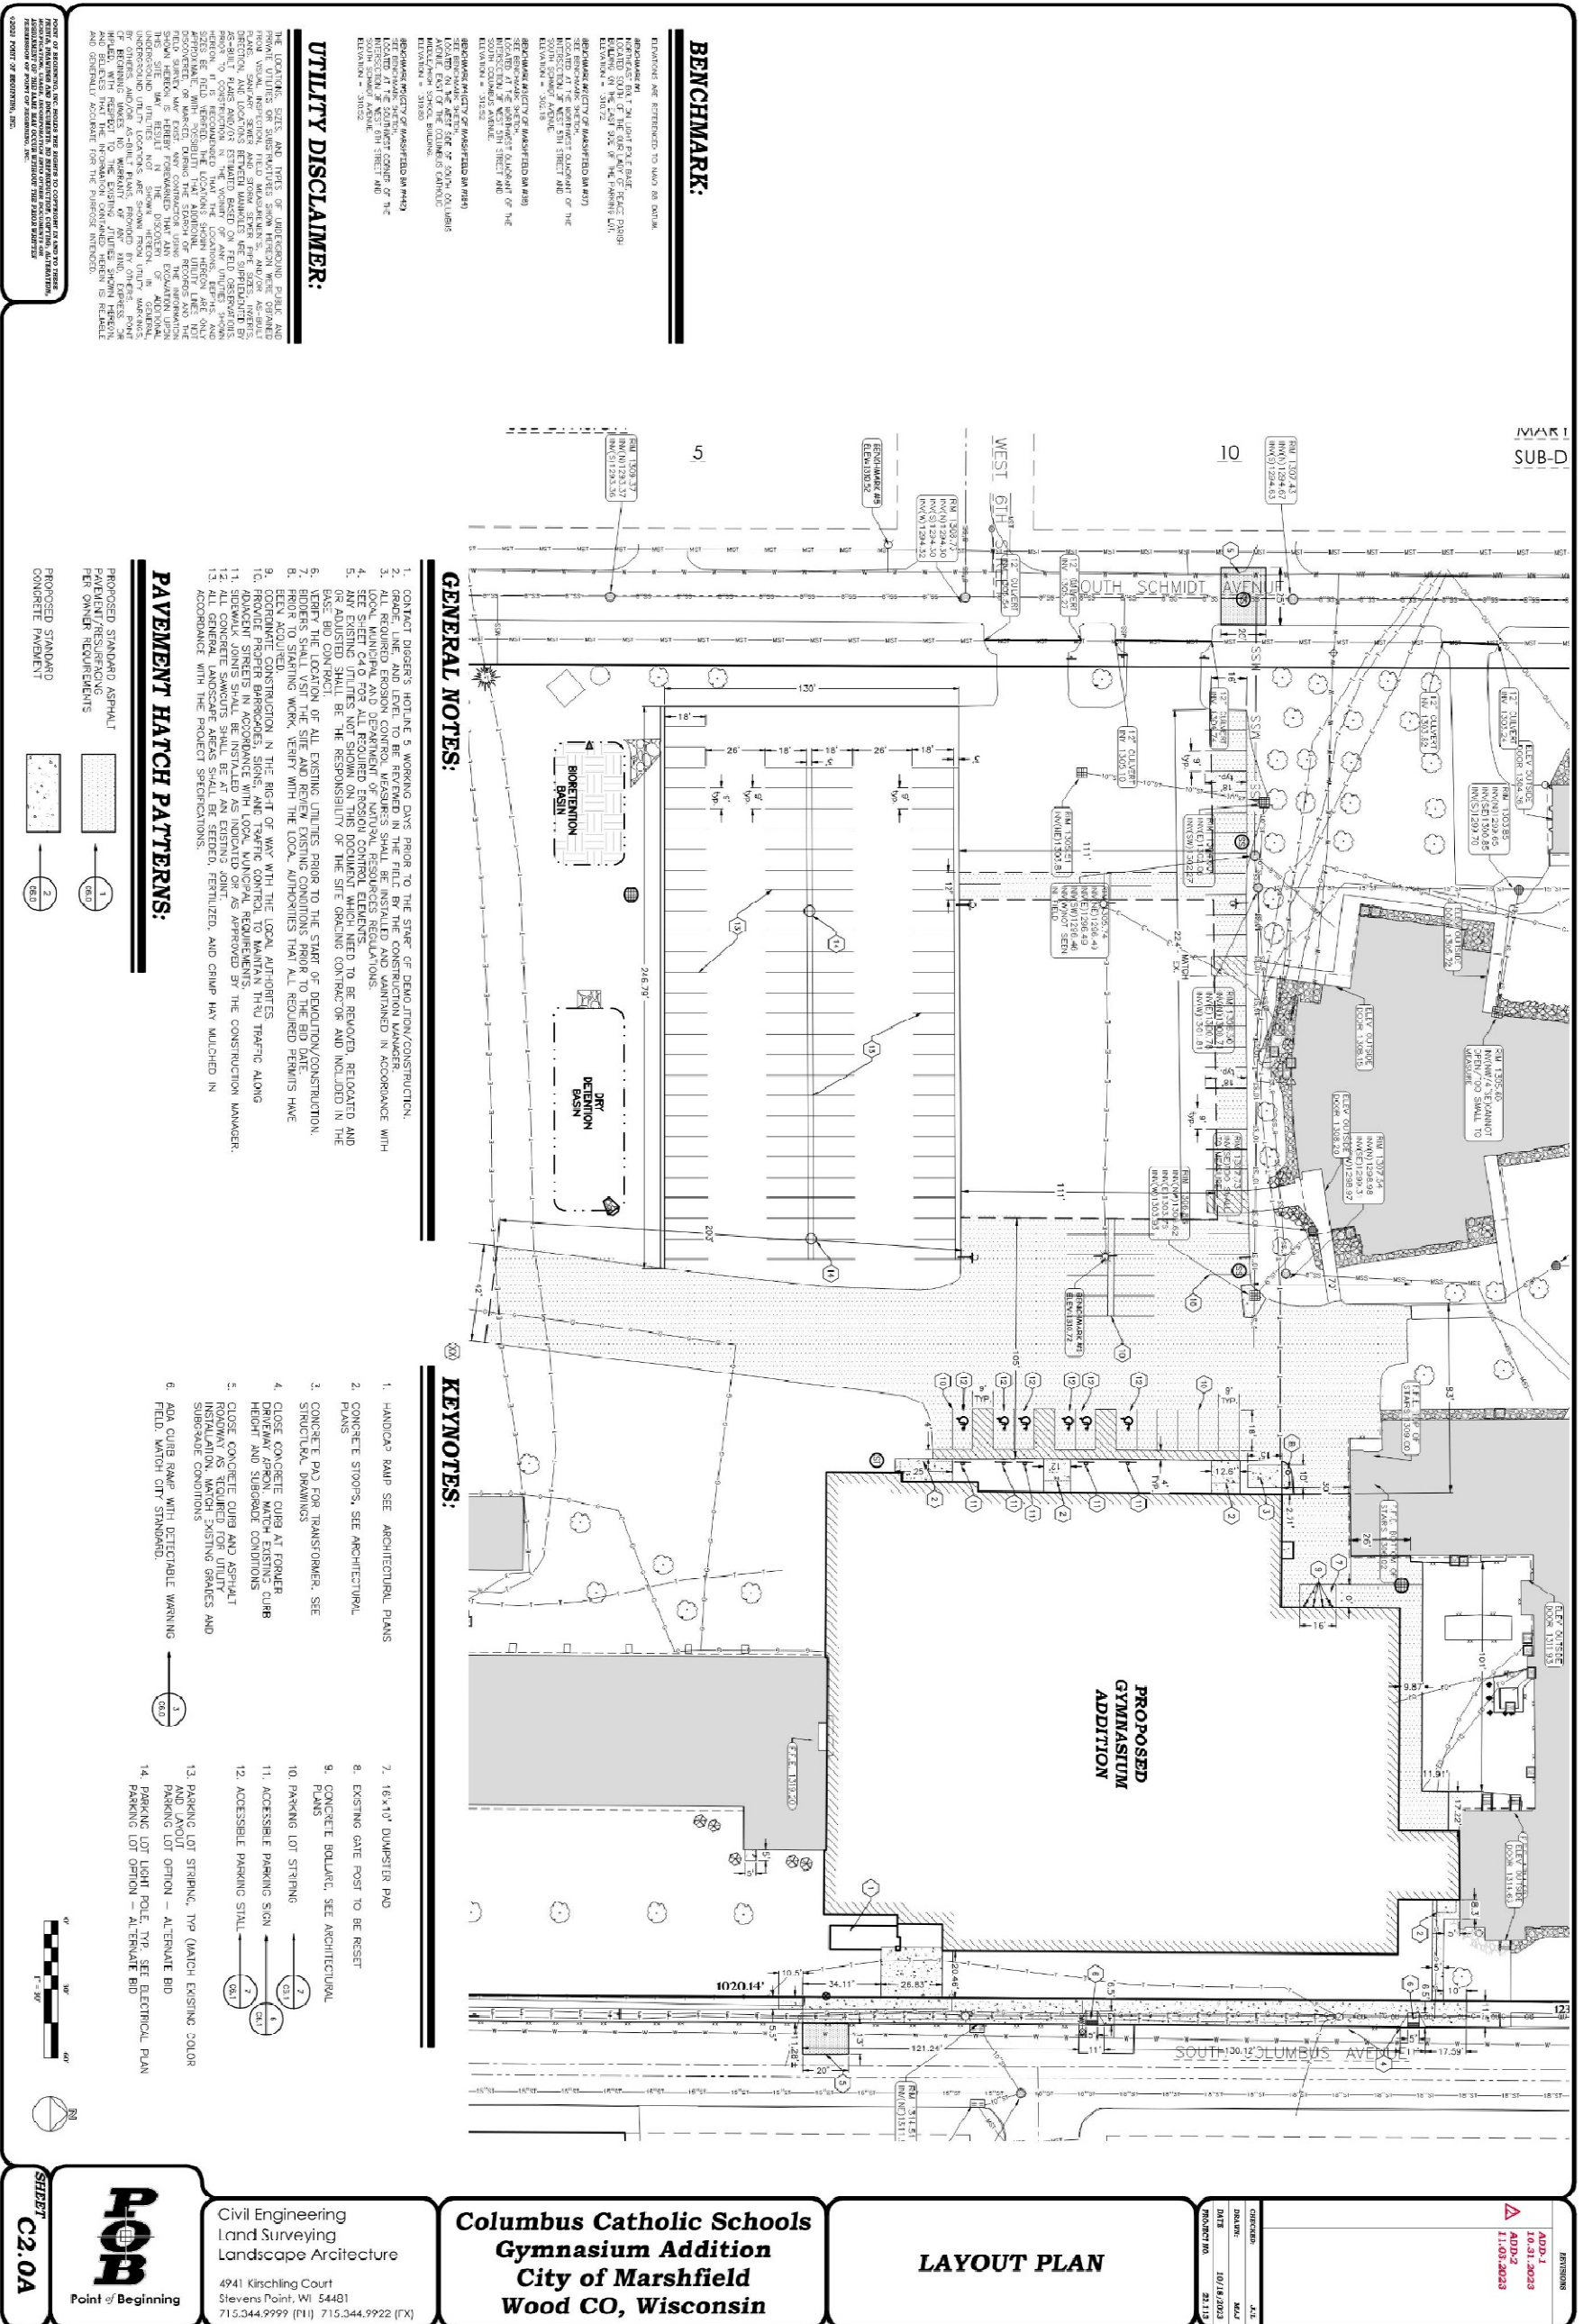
PROPOSED GYMNASIUM ADDITION LAYOUT PLAN (Updated)
